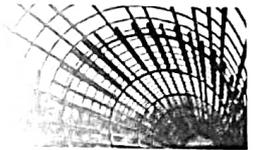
Section of Slab Showing details of Reinforcement
